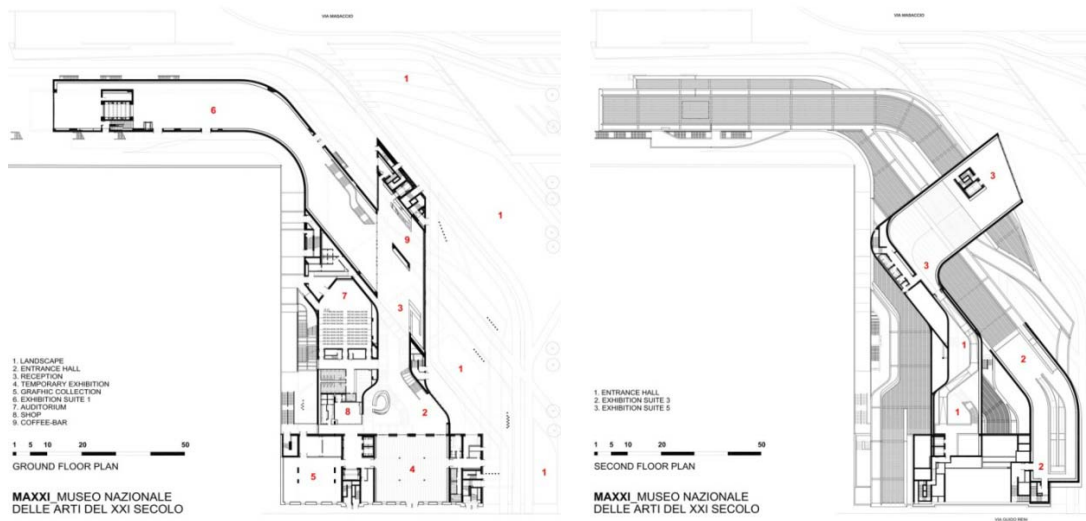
Zaha Hadid, MA XXI National Museum of 21st Century Arts, ground floor plan (left) and second floor plan (right). From: <http://www.archdaily.com/43822/maxxi-museum-zaha-hadid-architects/>, accessed December 09, 2013.
